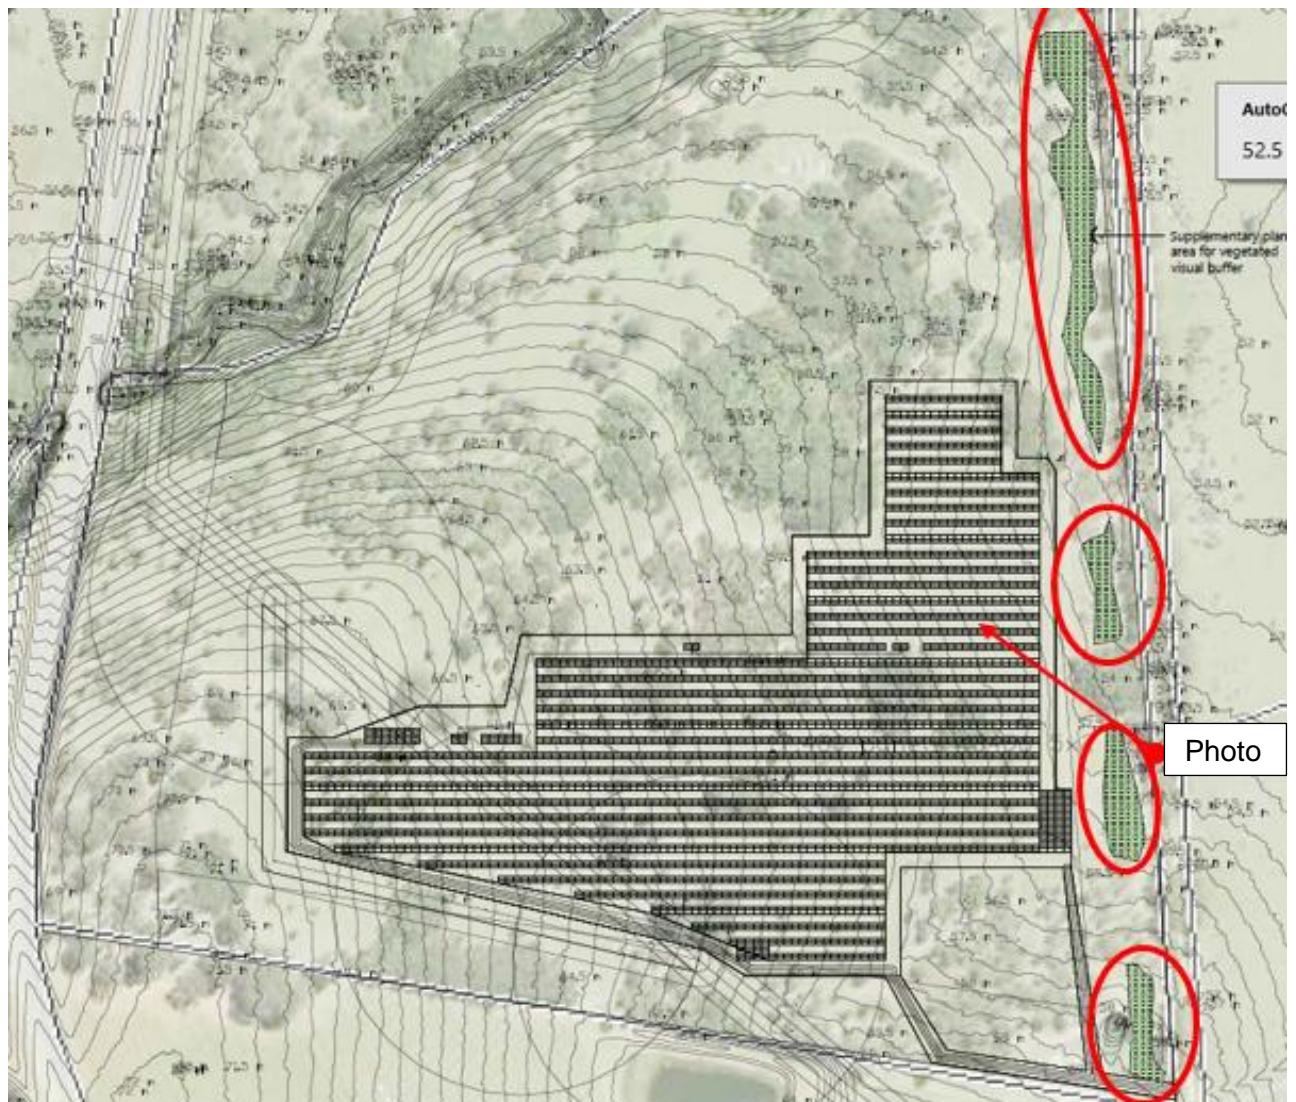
Proposed supplementary planting areas along Wills Hill Road.
